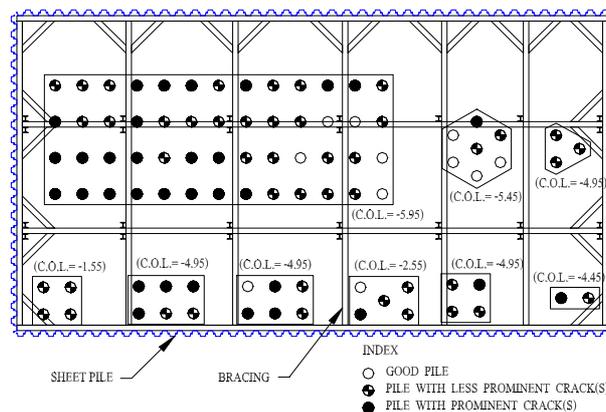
Layout plan showing part of bored piles, sheet pile wall and bracing system – Case III
